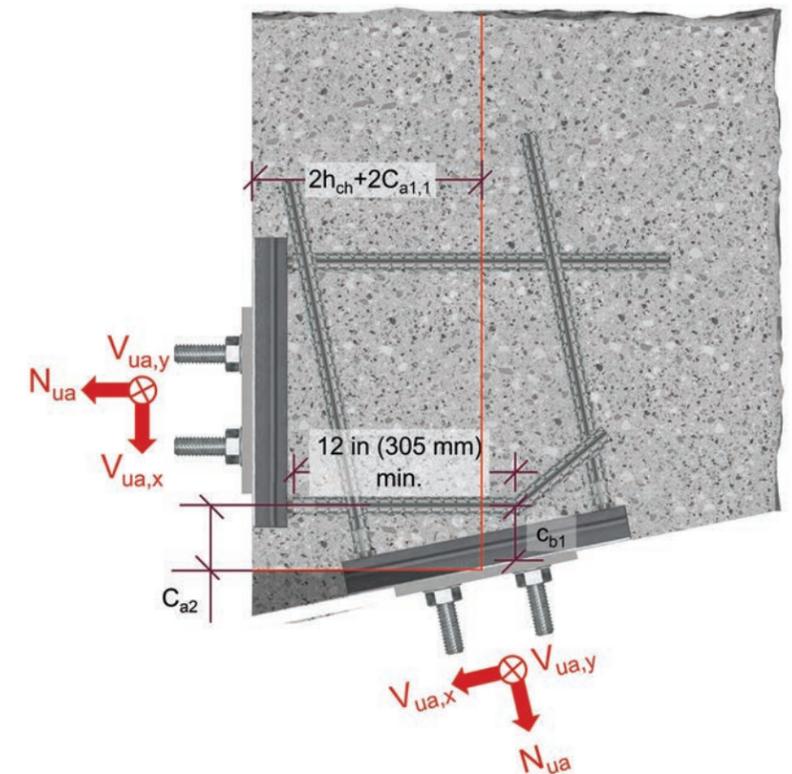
HAC CRFOS U — Anchor channels on both sides — Acute angle Corner — Plan View.
